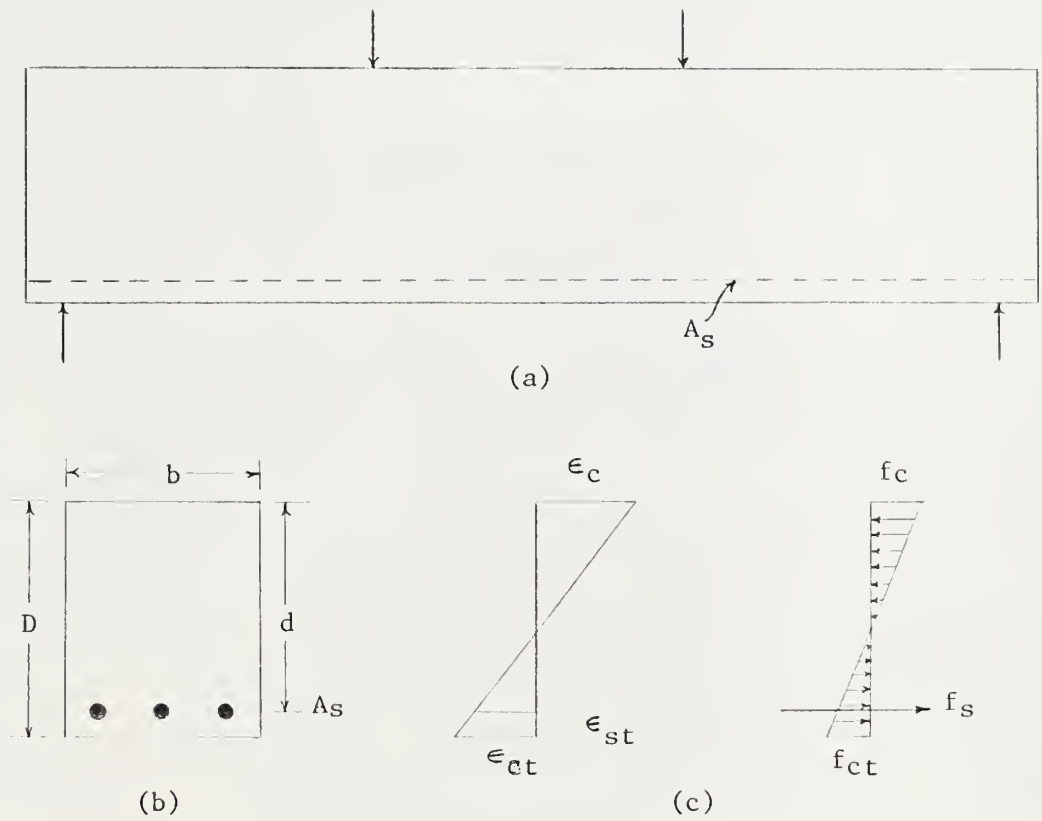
, Behaviour of Reinforced Concrete Beam under Load.
